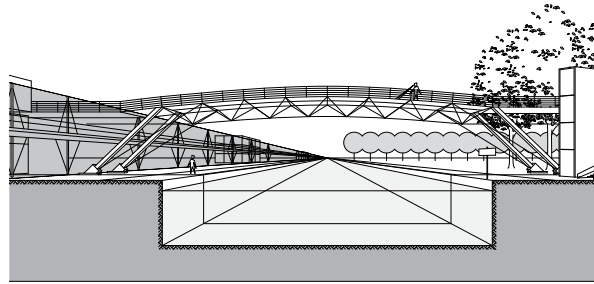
Sectional elevation: Galerie de l'Ourcq and pedestrian bridge. (Drawing: Tim Peeters & Author).
